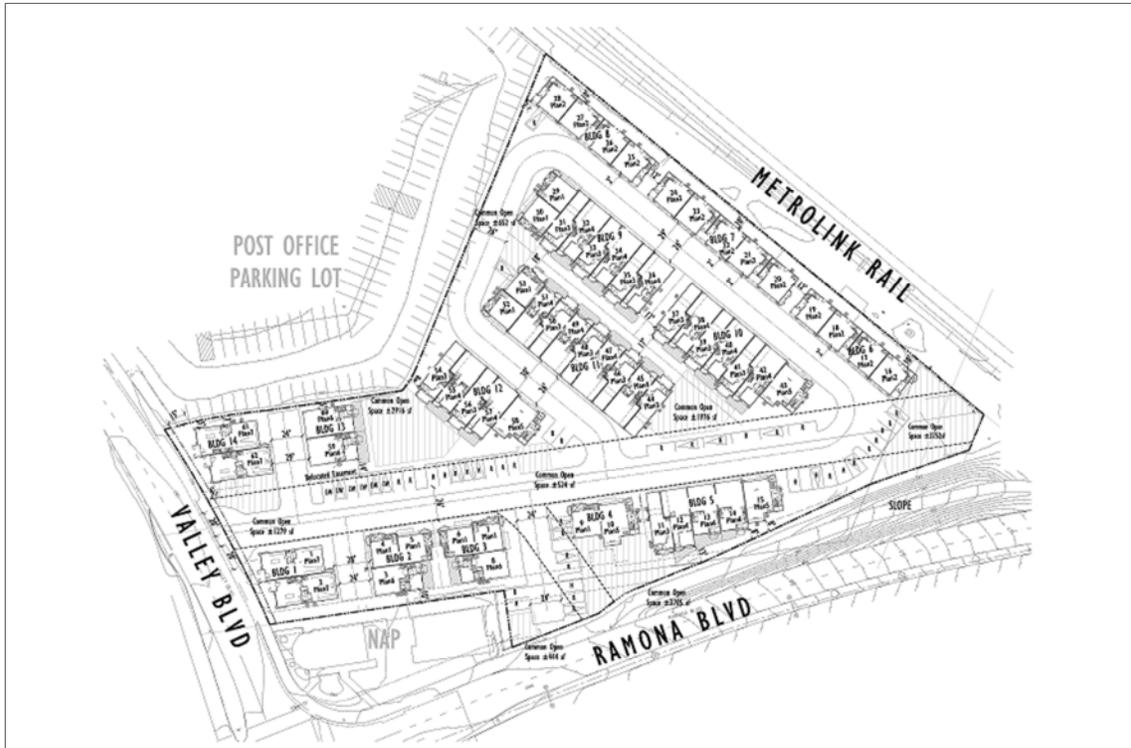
PROJECT CONCEPT SITE PLAN FOR THE VALLEY & RAMONA RESIDENTIAL
